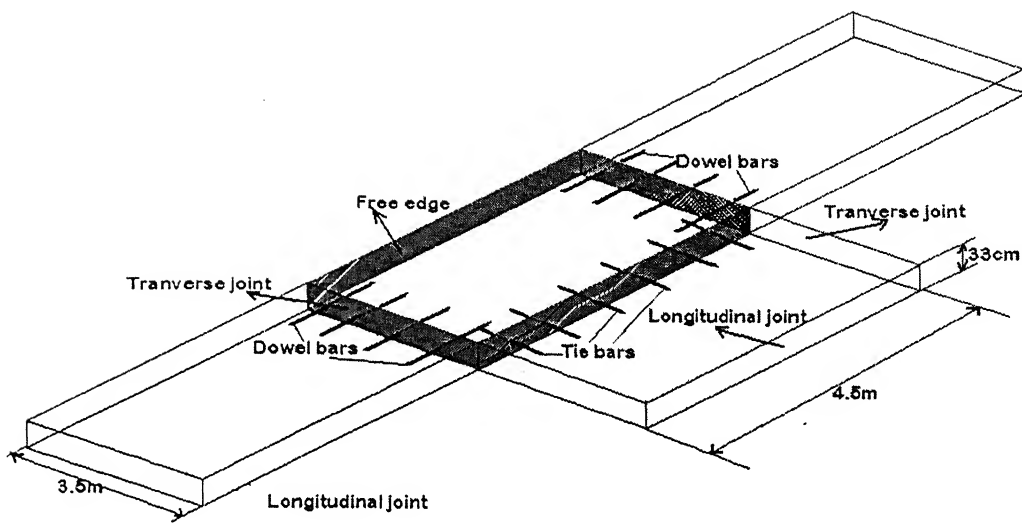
Schematic representation of the pavement showing the dowel and tie bars
